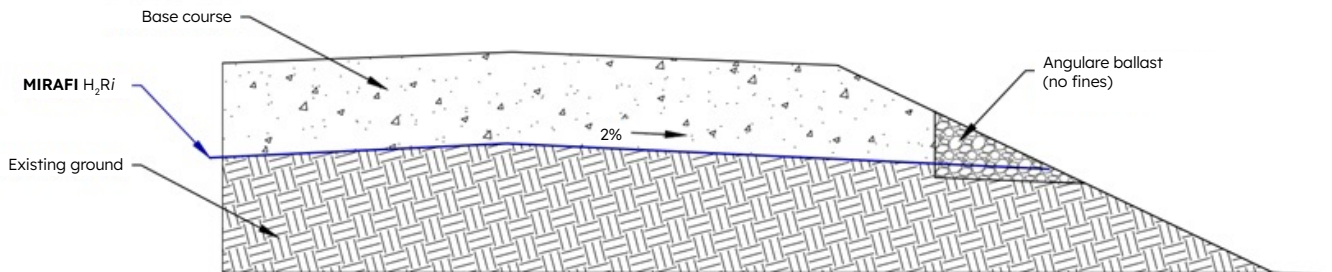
Embankment MIRAFI H₂Ri daylight to ballast or rock slope detail
